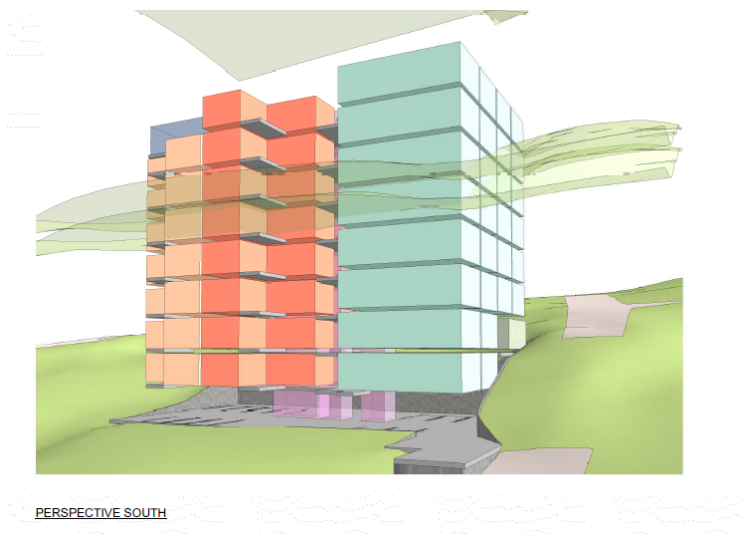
Development Overview (Bulk & Location plan by PB&A)
